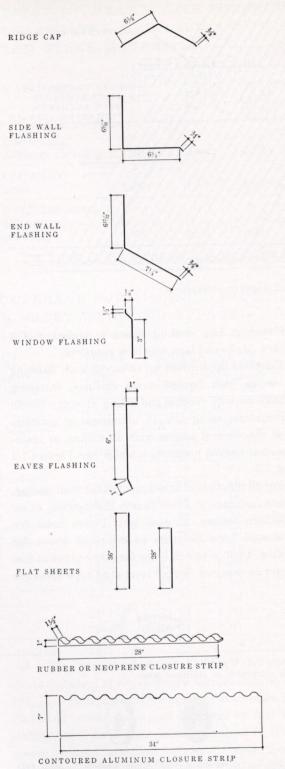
Typical flashing accessories for corrugated industrial roofing and siding.
